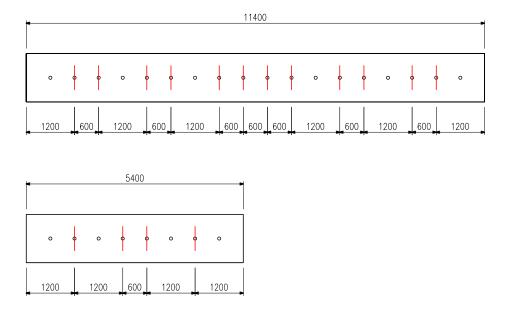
Details of the spacing between transverse stiffeners, the spacing in the 5400mm beam is based on the spacing in the 11400mm beam
